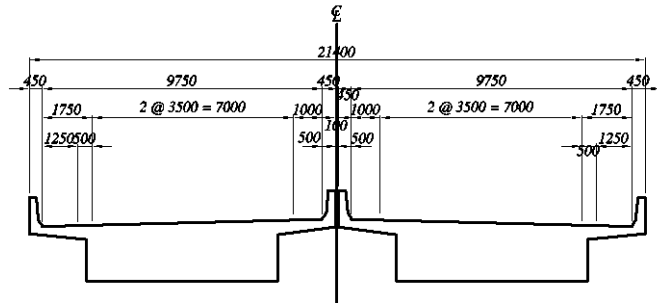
Typical Cross Section for Port Access Road Bridge (4-lane)
